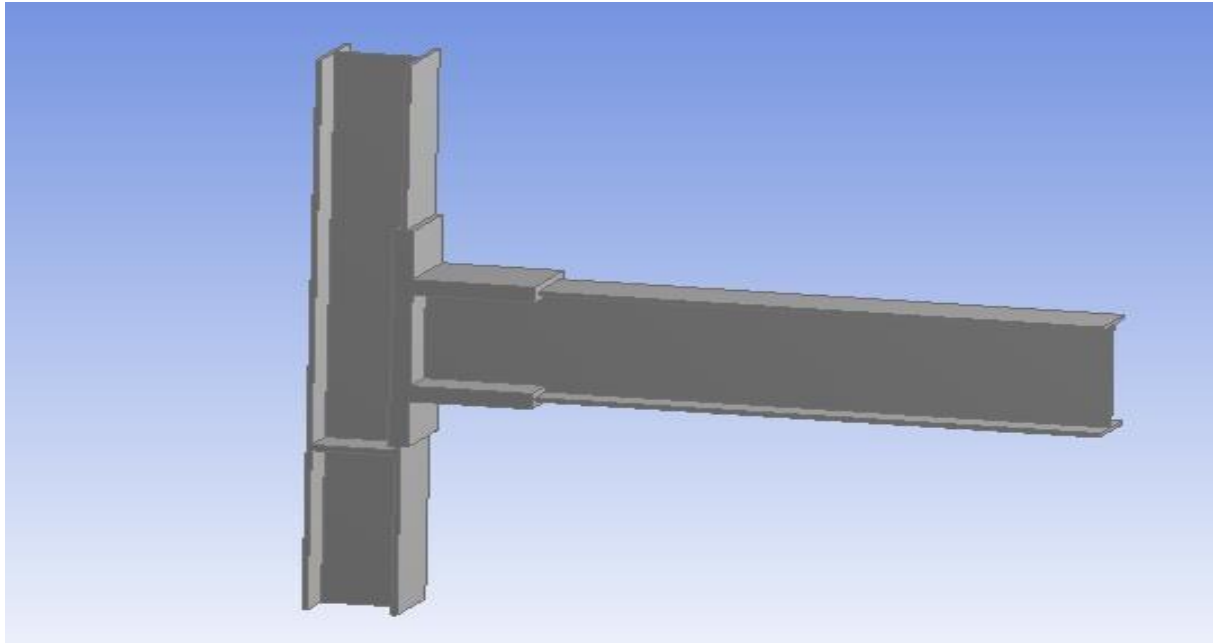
Design 3 showing rectangular joints perpendicularly
